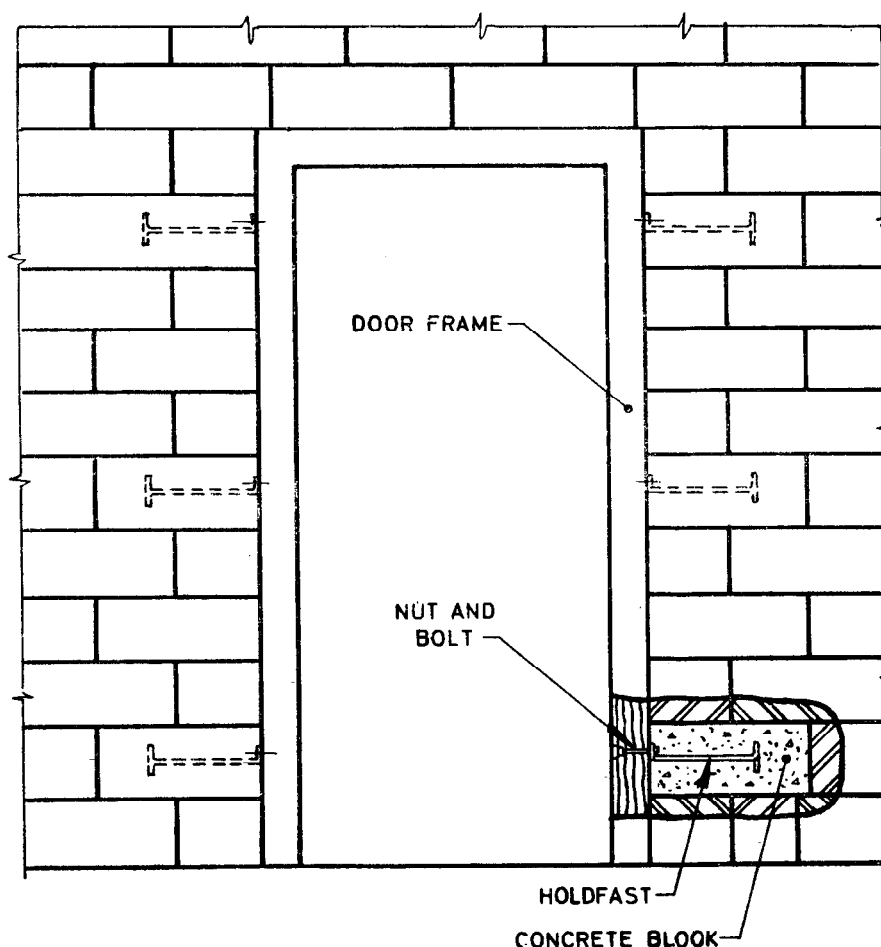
POSITION OF HOLDFASTS TO DOOR FRAME
